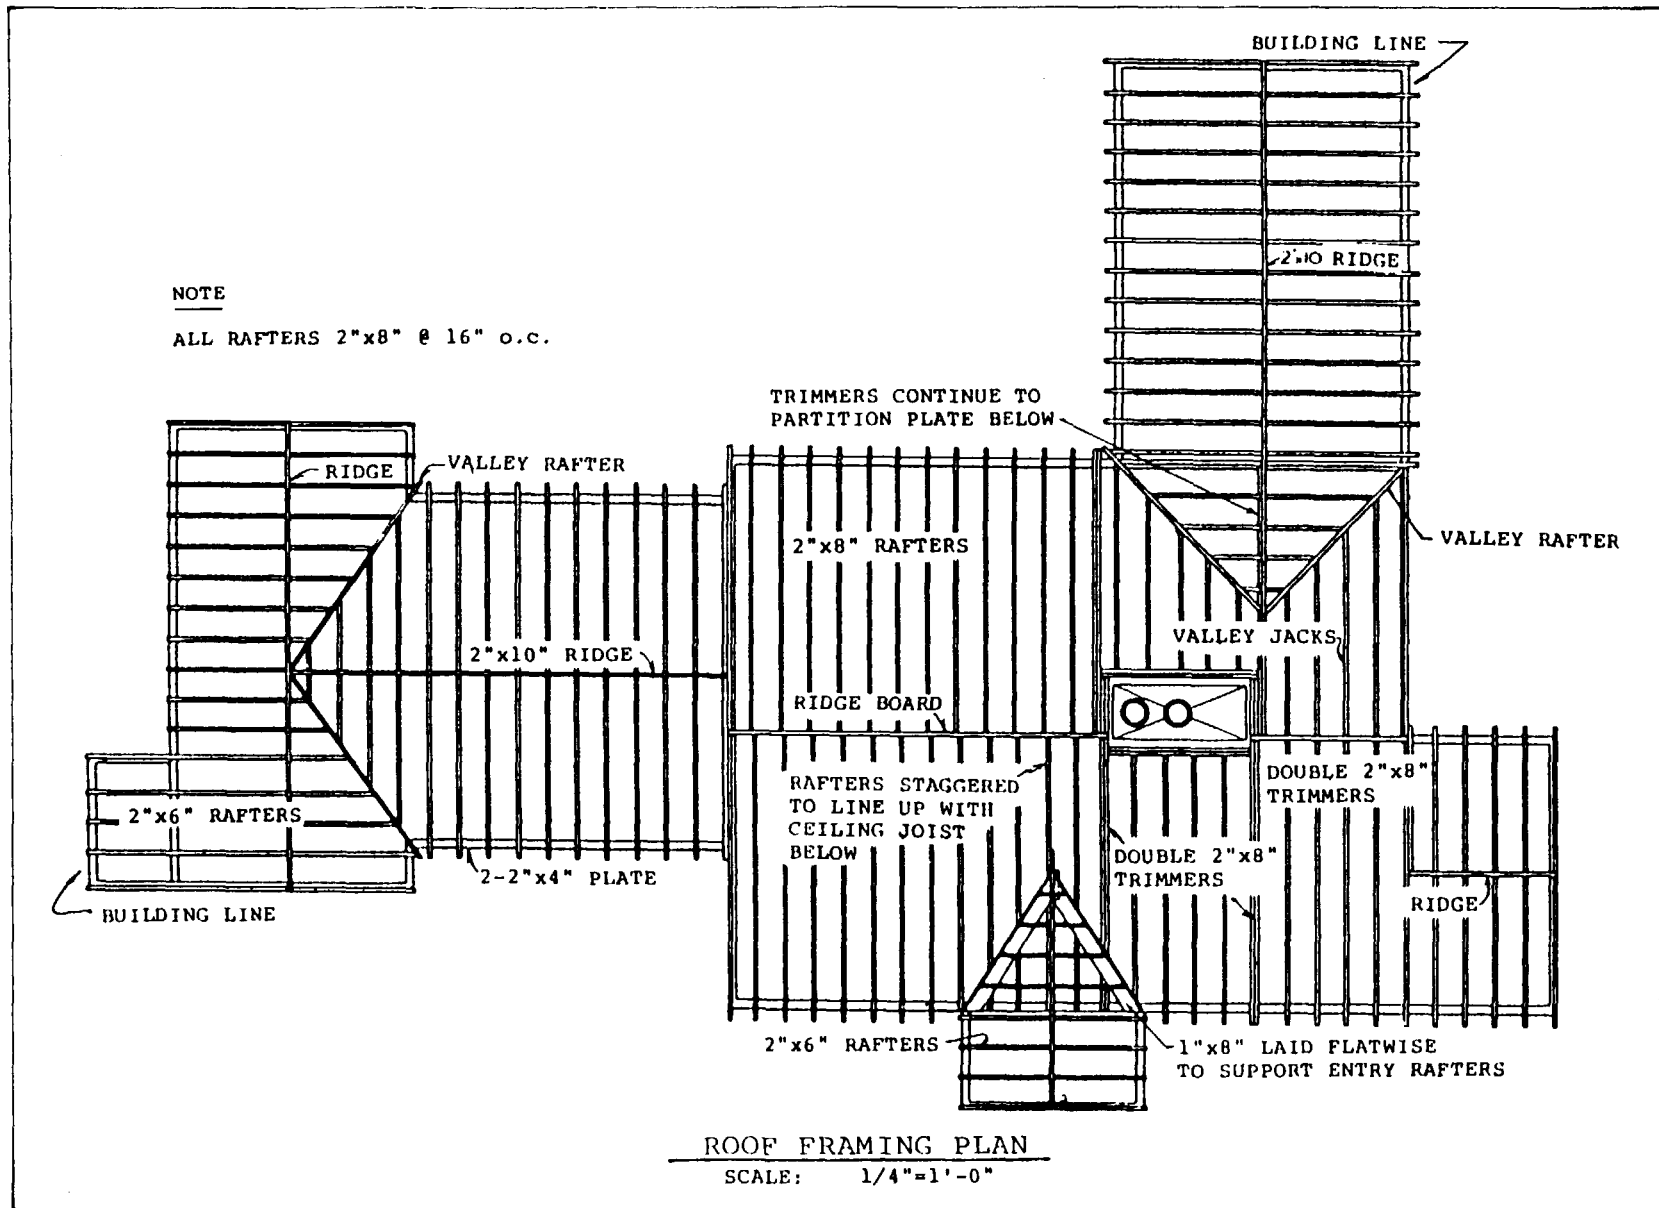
Typical structural roof framing plan for a wood-frame construction.
